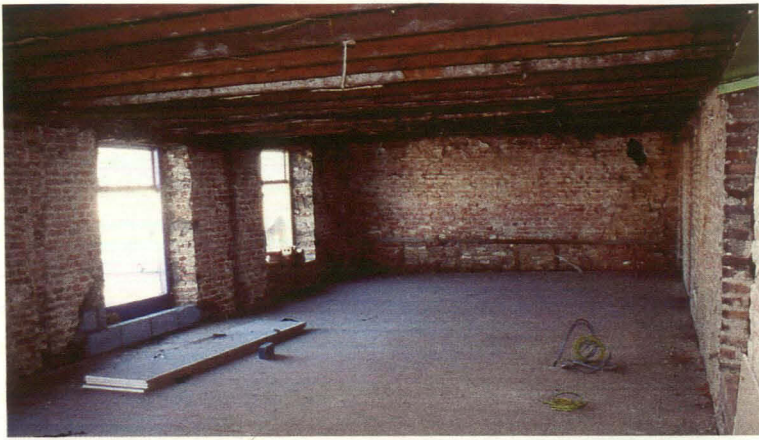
Upper Floor, area of eastern section of housing terrace, showing timber lacing in east wall, looking northeast
